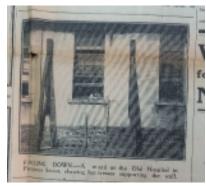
Volkshospitaal wall damage (NARSSA, 2023)
